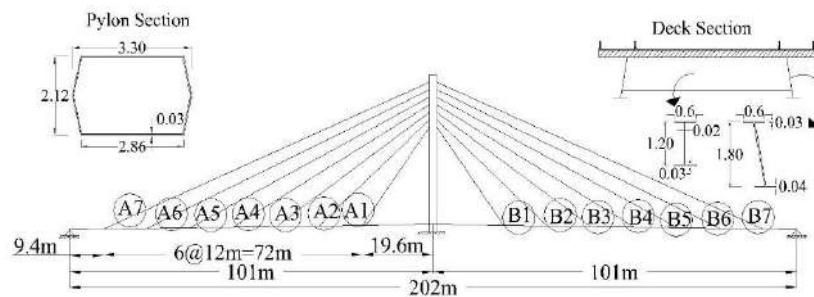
Manavgat cable-stayed bridge arrangement and the cross-section of the bridge members
